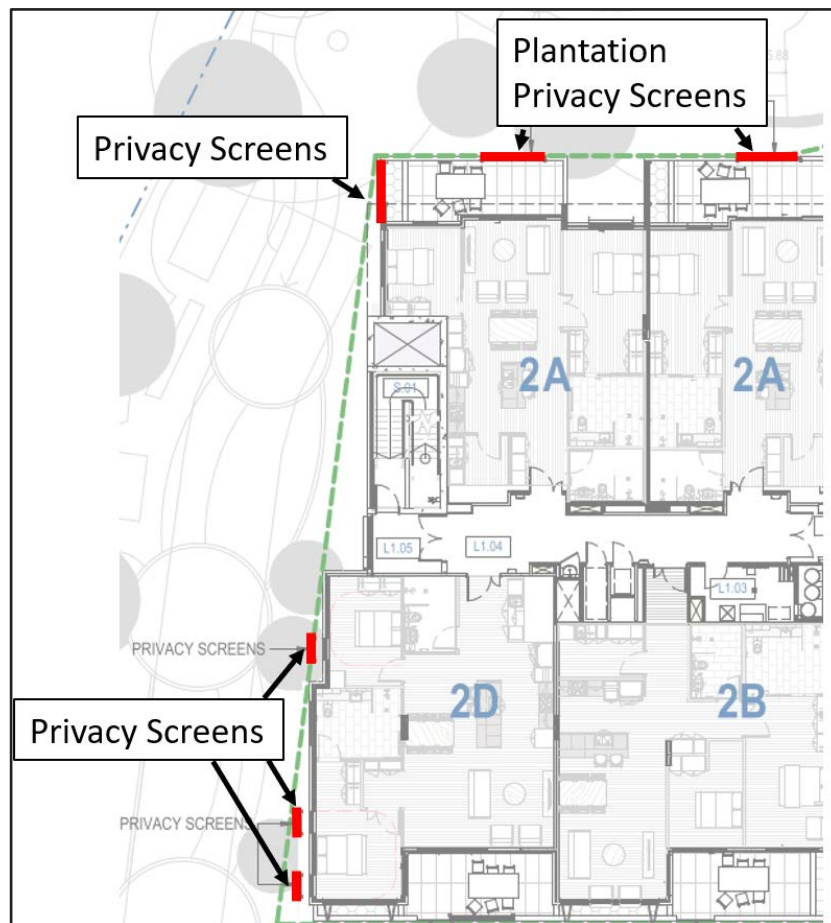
| Locations of plantation privacy screens and aluminium privacy screens (Base Image Source: Applicant’s Architectural Plans)
